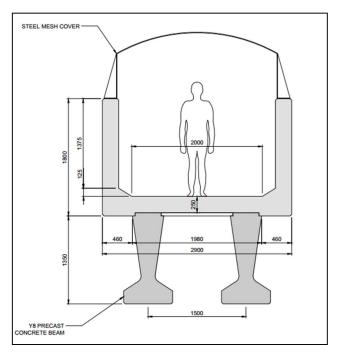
Emerging Preferred Option - Bridge replacement, cross section
